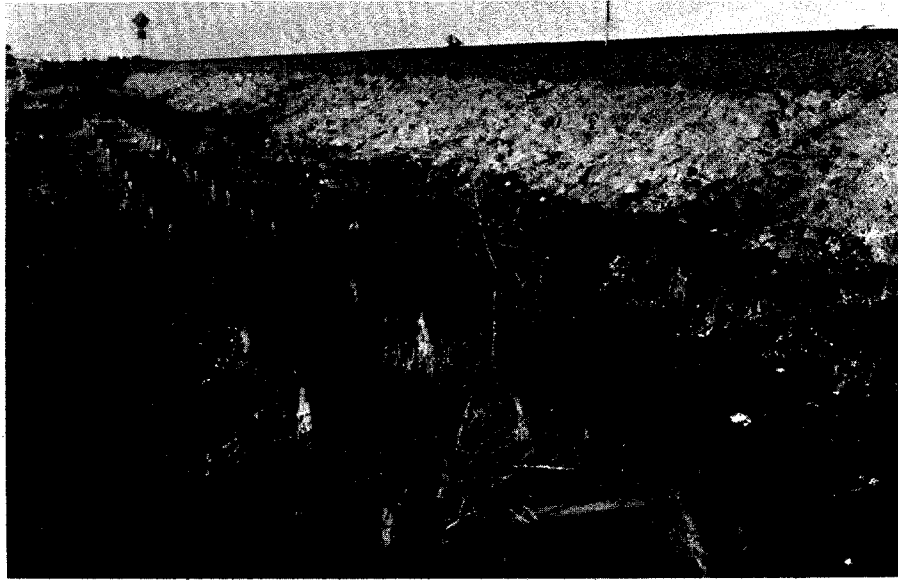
Light duty, double pipe-and-wire retard (center) and grouted rock revetment at approach embankment (right). Photographed in 1976.
